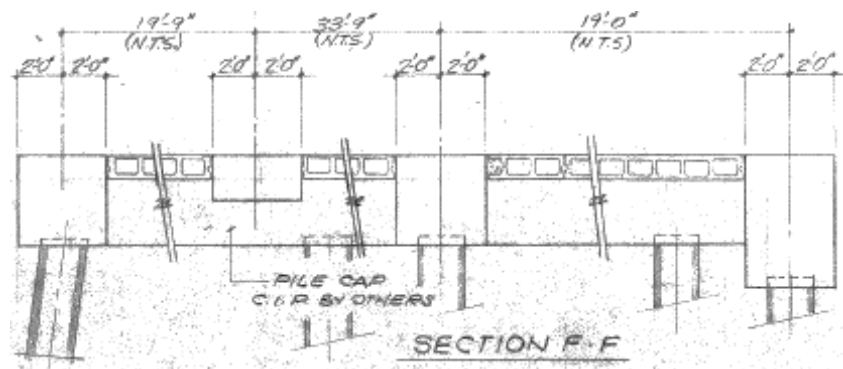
Cross-Section of Dock Superstructure – East End (Con-force DWG 9315-1)
